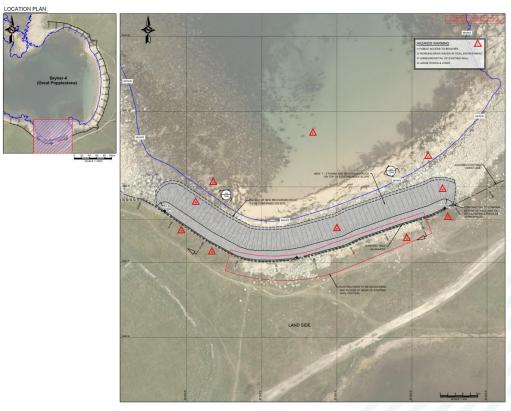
Extent of proposed raising of rock crest level sea wall at Great Popplestone (HR Wallingford, 2022)
